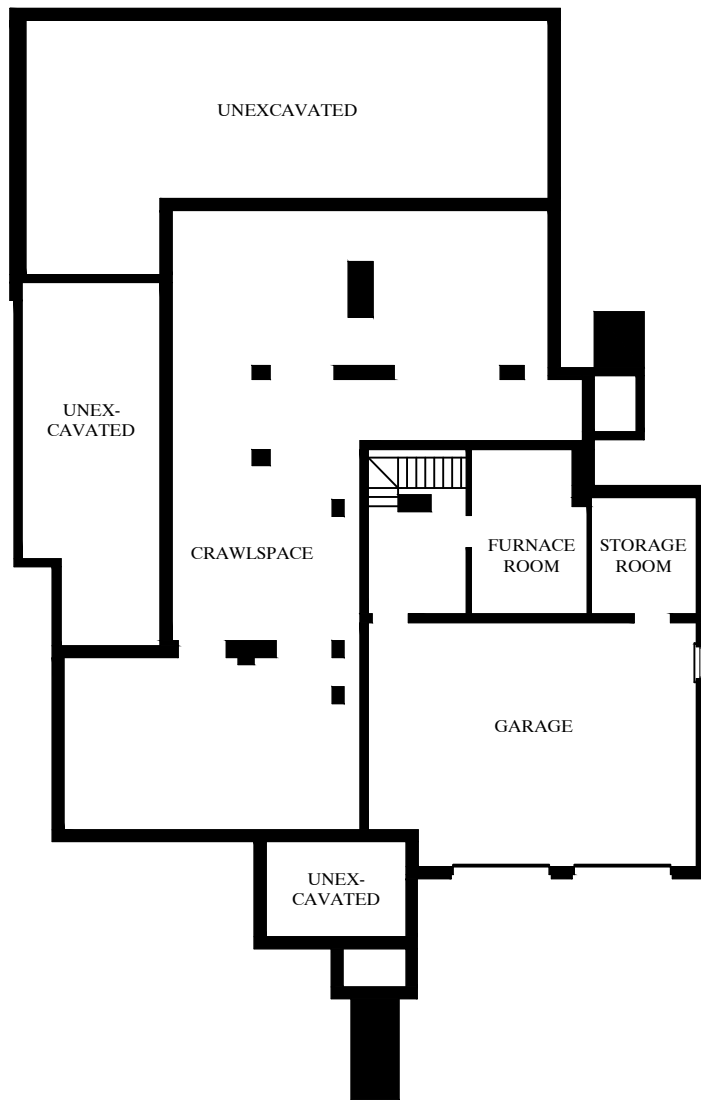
A2 Foundation Plan, Window & Door Schedules, 12/1964, Joseph W Robinson, Designer. (Source: MALU Archives.)
